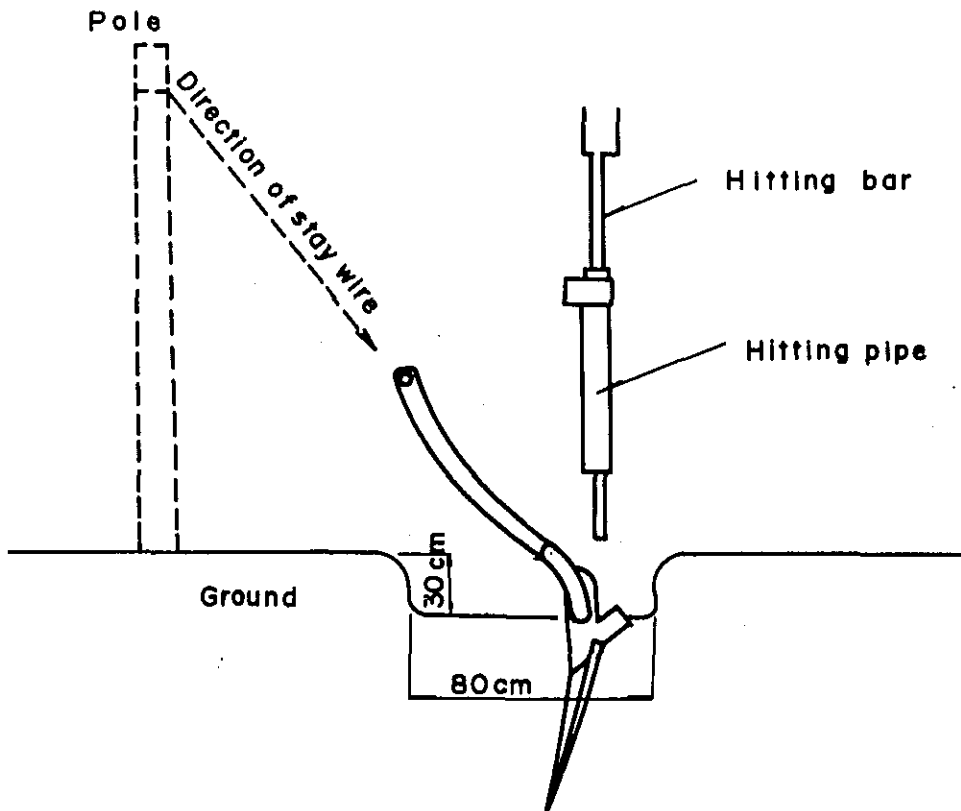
Installation of Stay Anchor (1/4)
